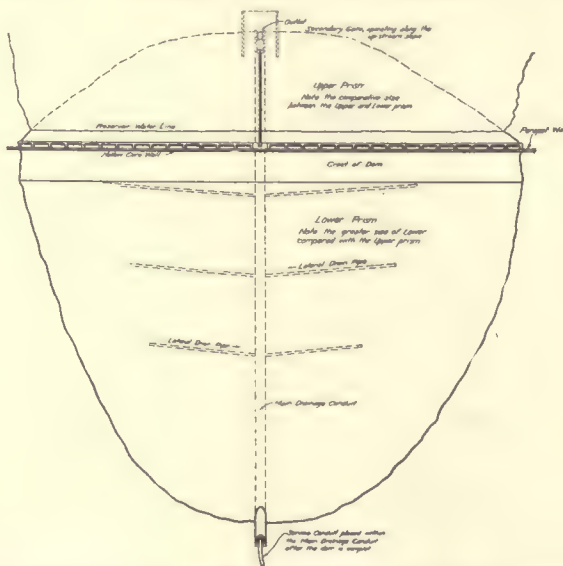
Pplan View Illustrating a Single Trunk Drain with Laterals as Applied in a Short Dam. In Long Dams the Trunk Drains Are in a Multiple, Without Laterals.
